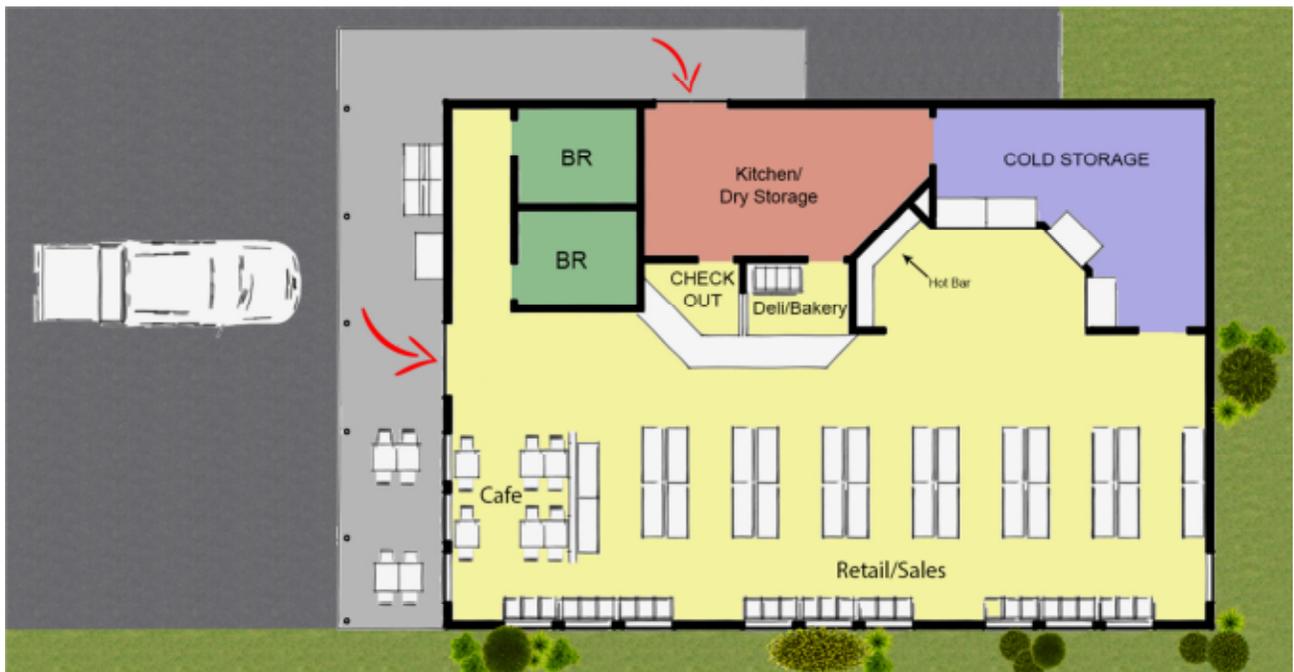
Proposed Floor Plan – 2,800 SF General Store
